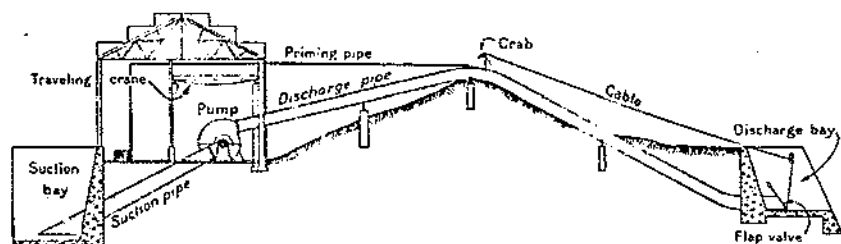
Elevation of well-designed pumping unit in Hartwell plant: Reinforced suction and discharge bays; horizontal entrance opening to inclined suction pipe; discharge pipe passing over top of levee, with long-radius bends; crab for lifting flap gate out of flow from pipe.
